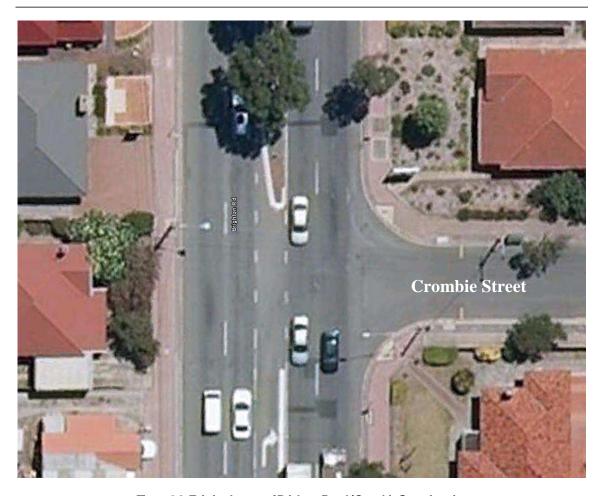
Existing Layout of Brighton Road / Crombie Street junction
